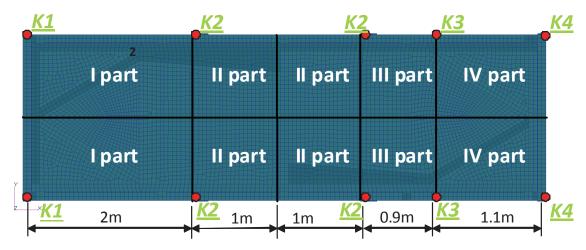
Schematic layout of the springs on a single segment of the bridge
